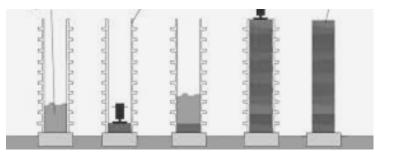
Construction method of the rammed earth wall (URL 5)
